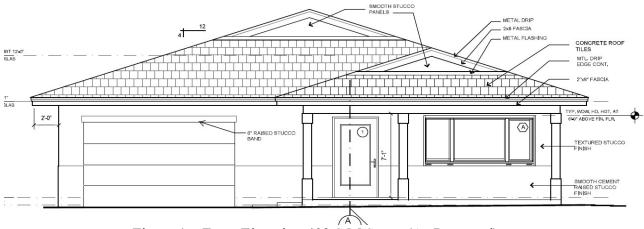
Front Elevation 403 S M Street (As Proposed)
